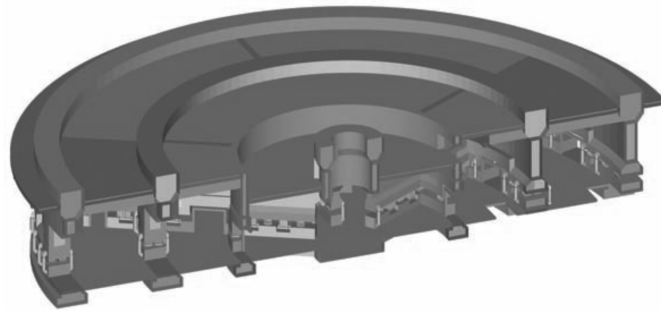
Telescope concrete pier (adapted from ESO [2011]).
